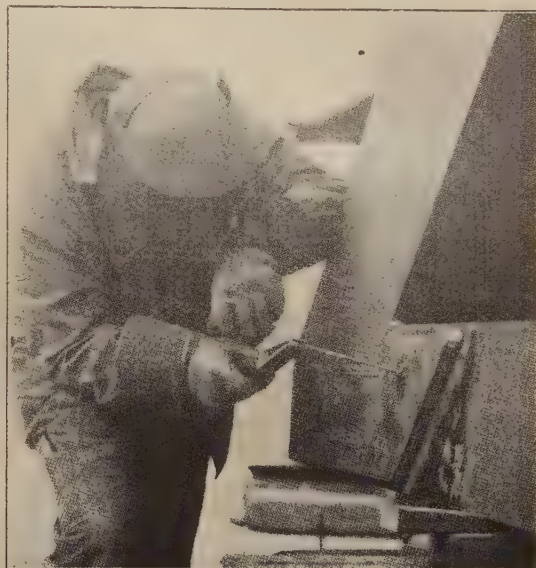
Welding the gusset plate on one of the lower chord end joints.
